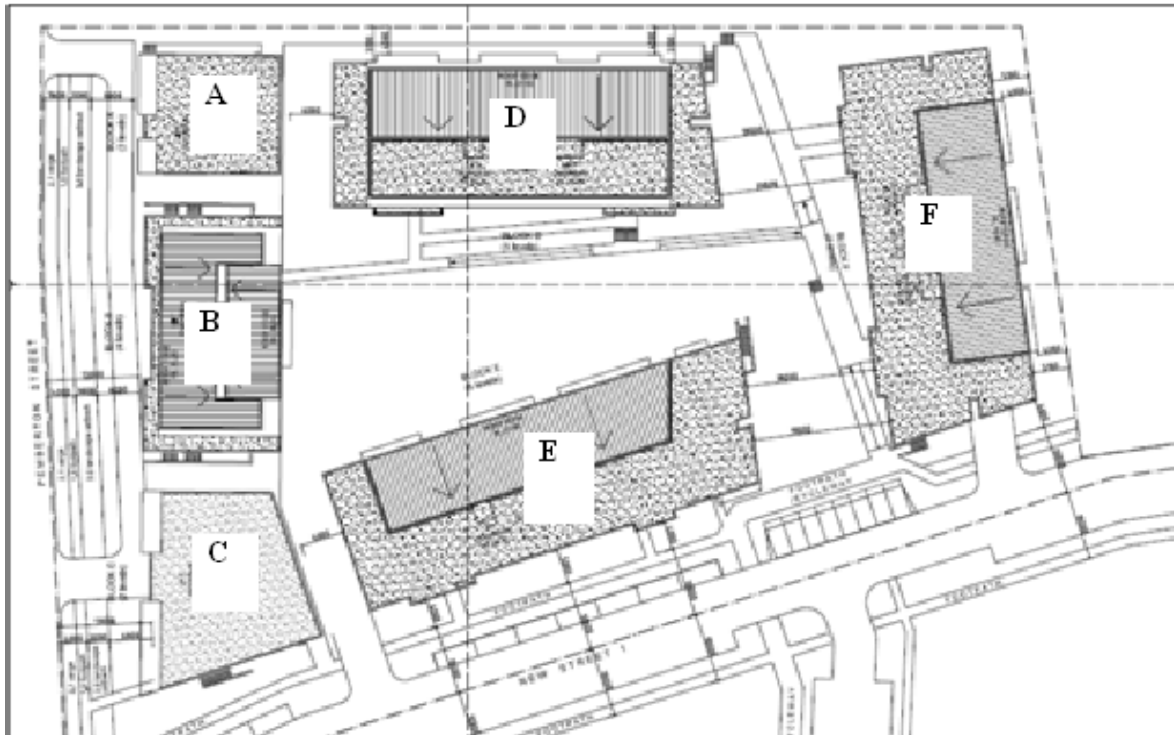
Roof Plan of Buildings A to F approved under DA10/313 and New Street 1 (to the south) – source Marchese + Partners Architects.
